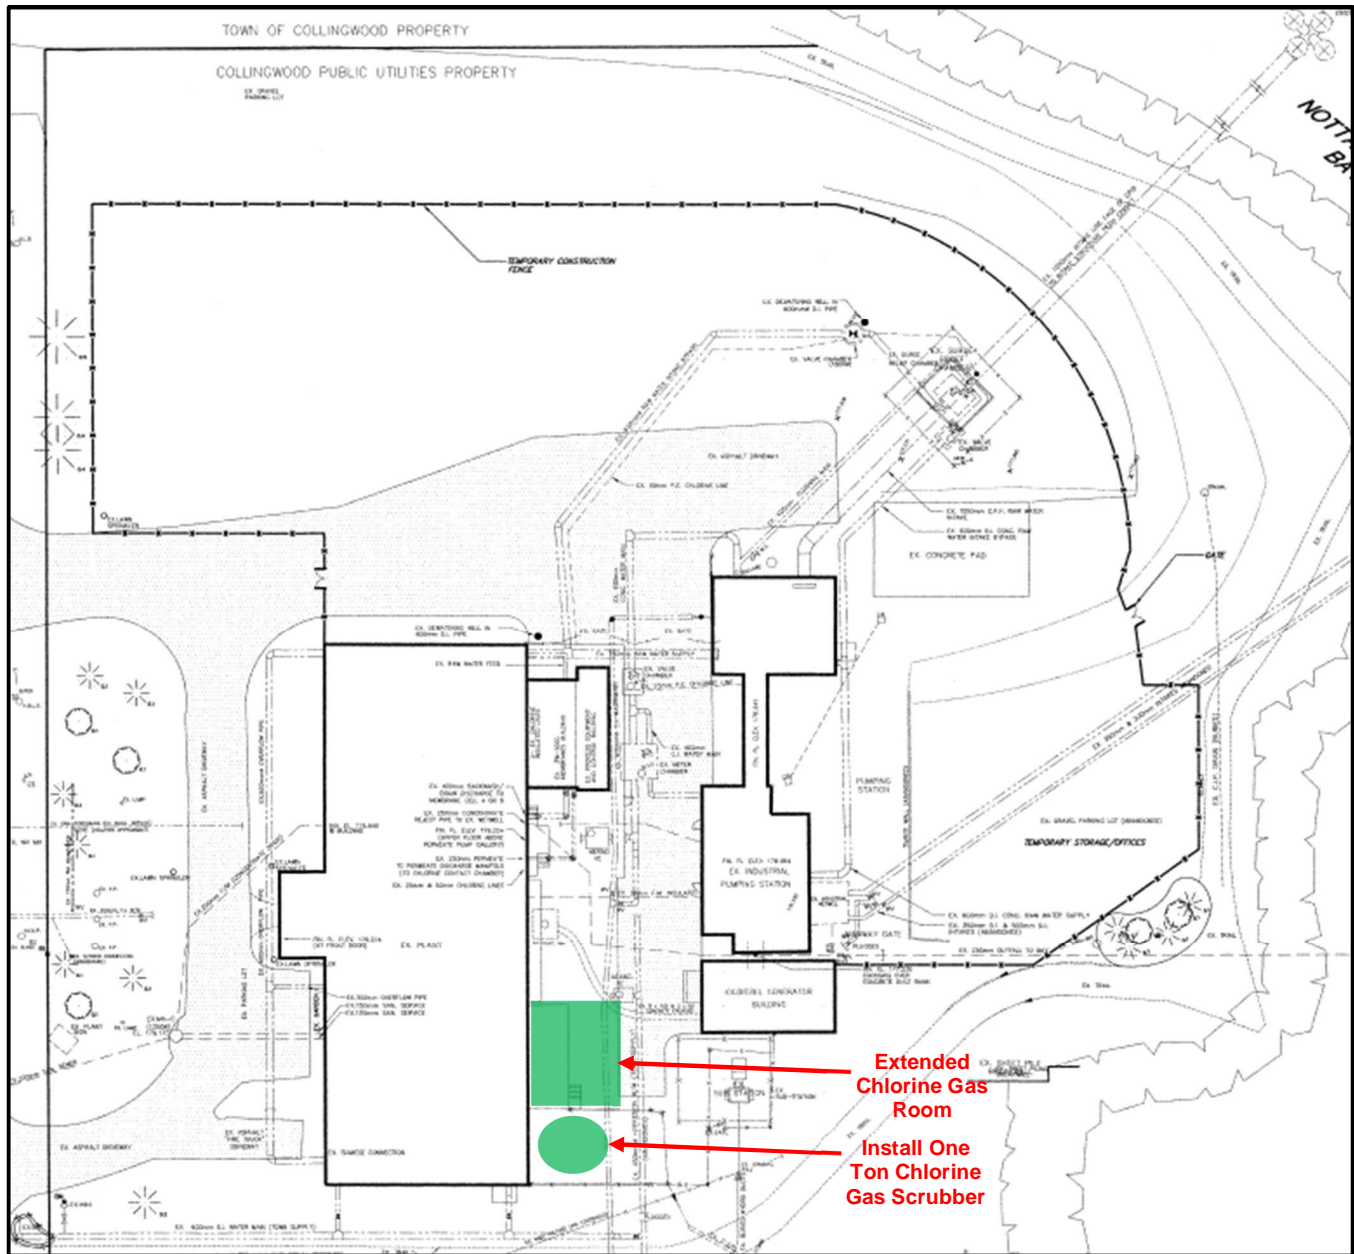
Proposed Extension of Chlorine Building and Addition of Chlorine Gas Scrubber
